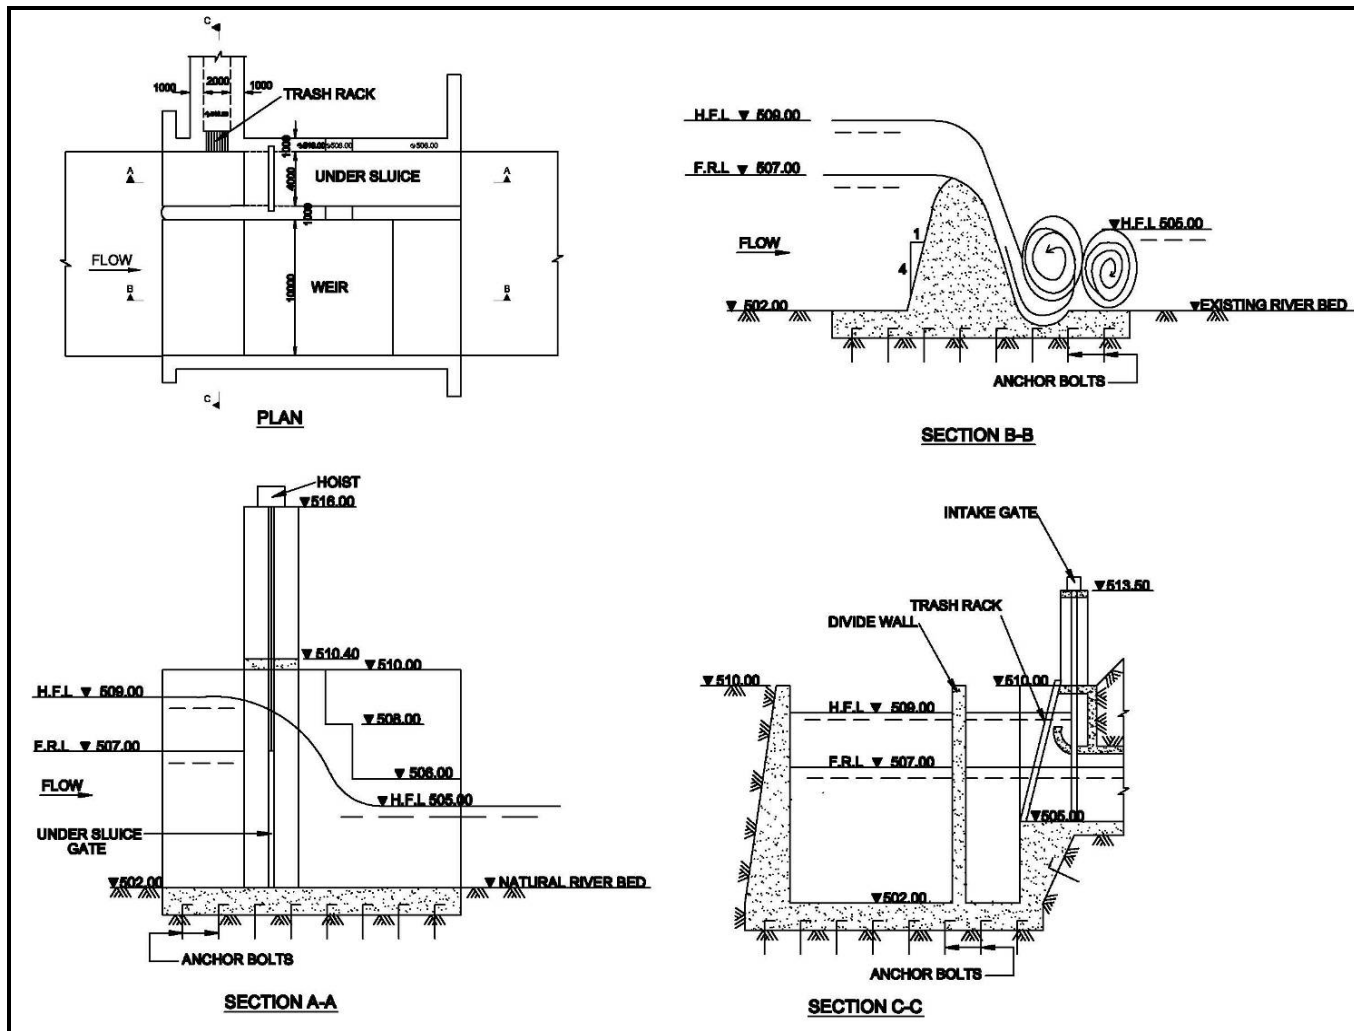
Typical Details of a Weir on Impermeable Foundation
